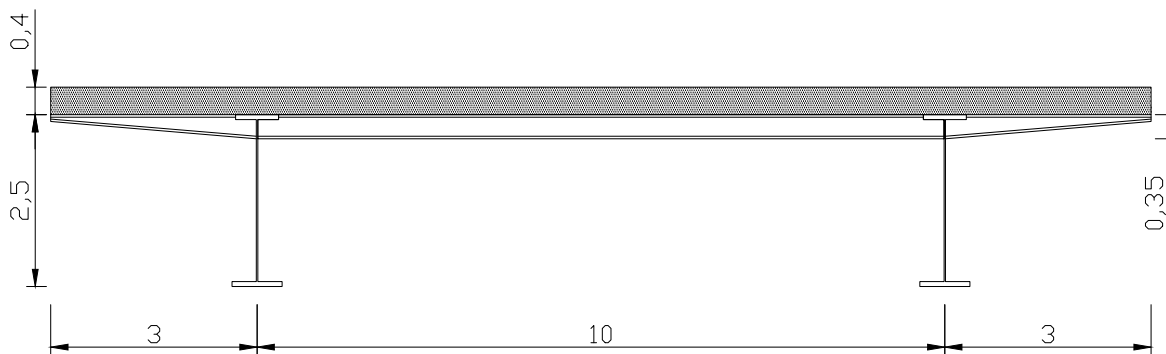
Schematic cross section of the statically determinate double-girder beam bridge [m]
